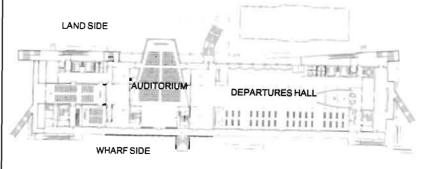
First floor plan showing departures hall and auditorium. (Dalco. 2003: 26)
